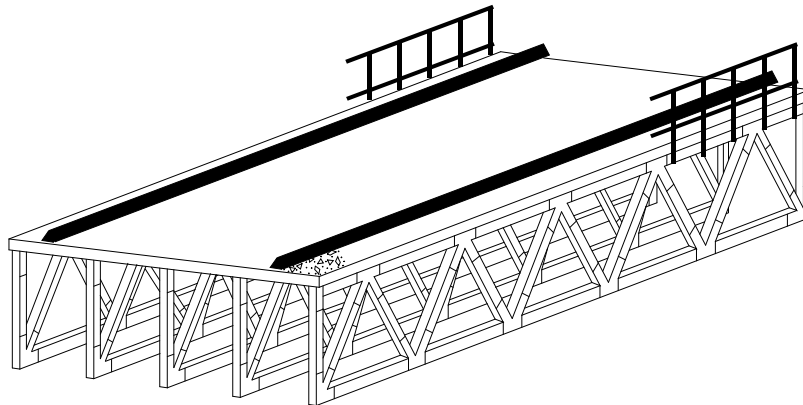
Timber-concrete bridge with timber truss beams, *ad.* (Moraes 2007)
